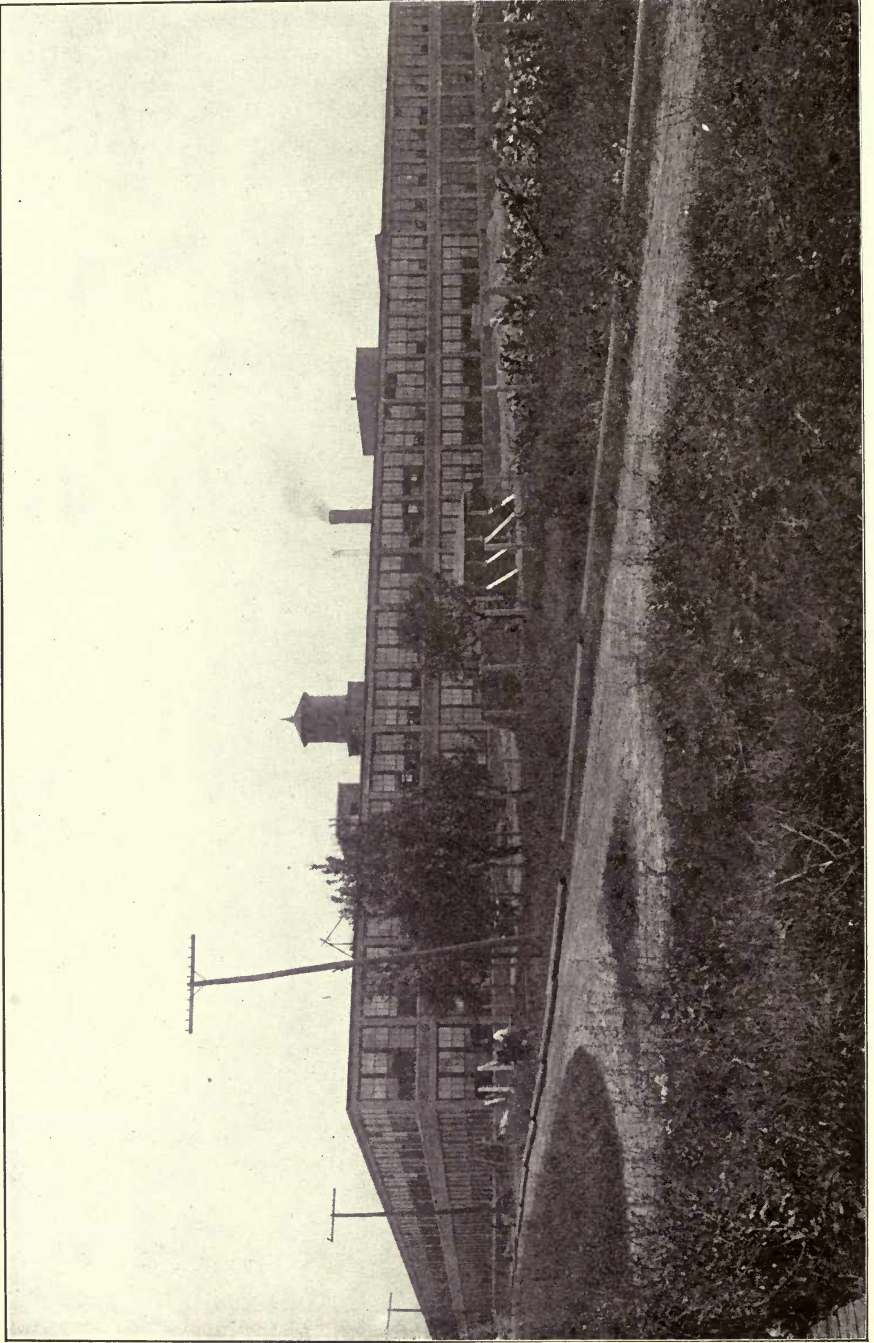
Packard Motor Car Factory. (See p. 131.)
